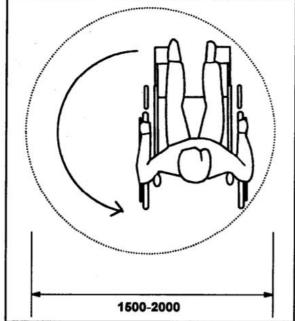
Standard wheel chair dimension with turning space (sizes in mm) (Verbeek P, 2010)
